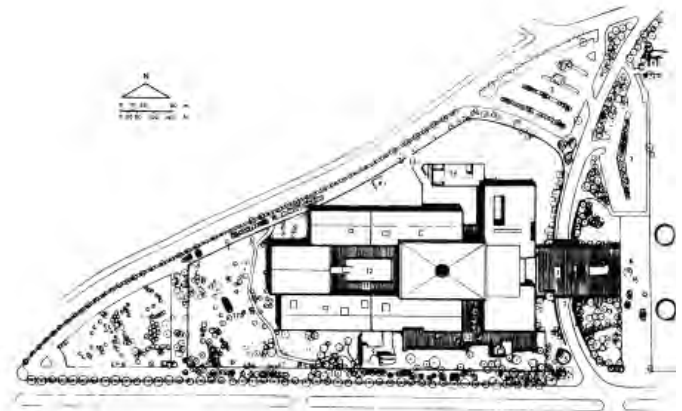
Site Plan (ArchDaily Brasil, 2017)
